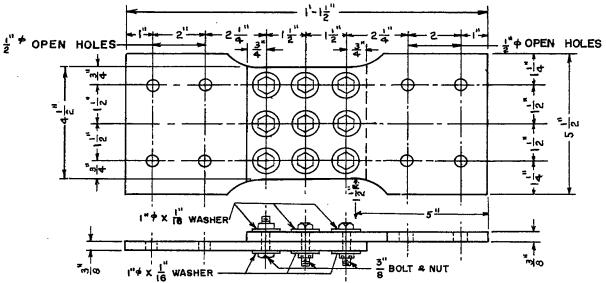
FATIGUE TEST SPECIMENS USED AT UNIVERSITY OF ILLINOIS FOR 0.375" SHEET.
